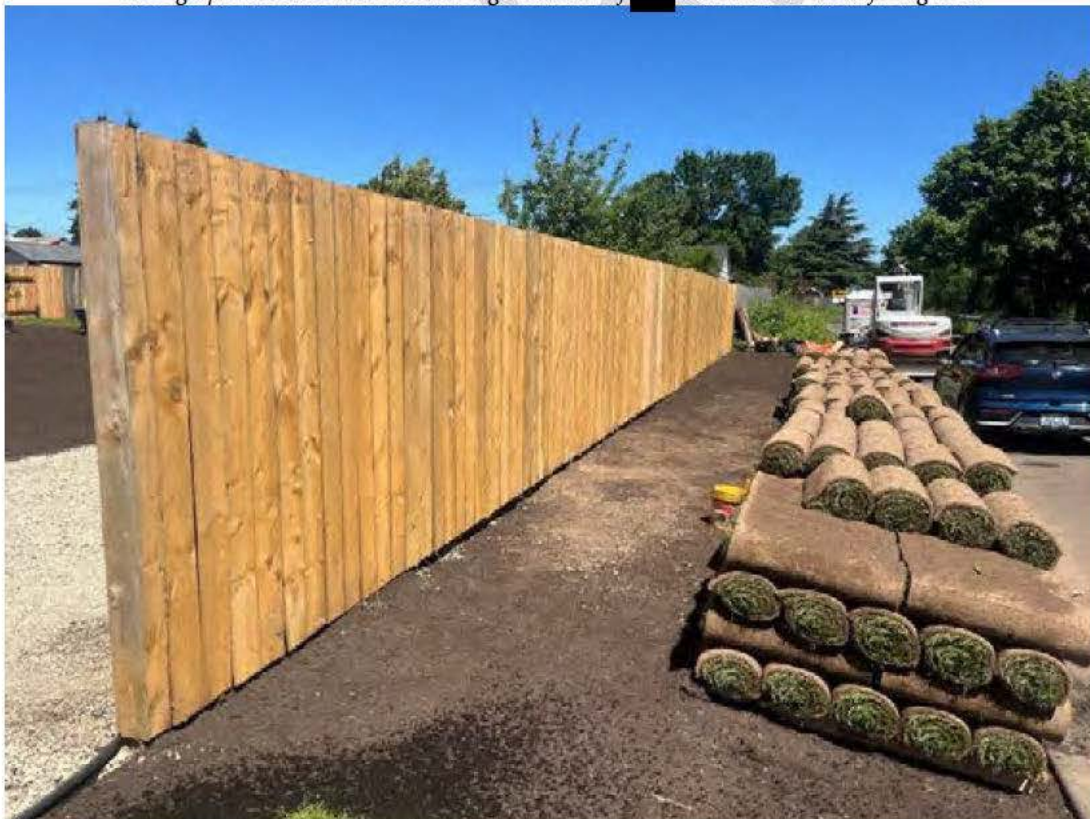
Sod installtion along ROW to the south of [REDACTED] Baxter. Photo taken facing east.
